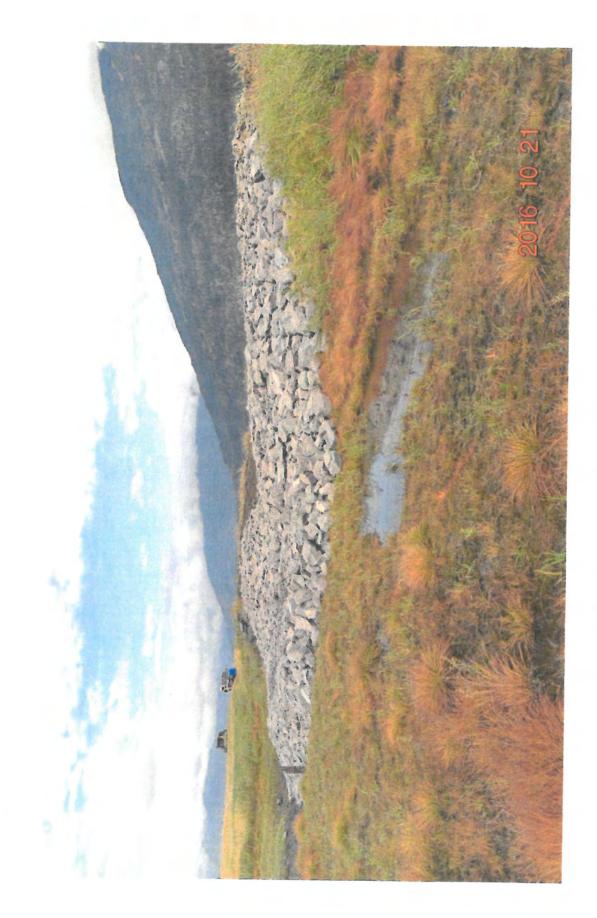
TRIMMING AND PACKING UP TO ELEVATION 433.5 M
